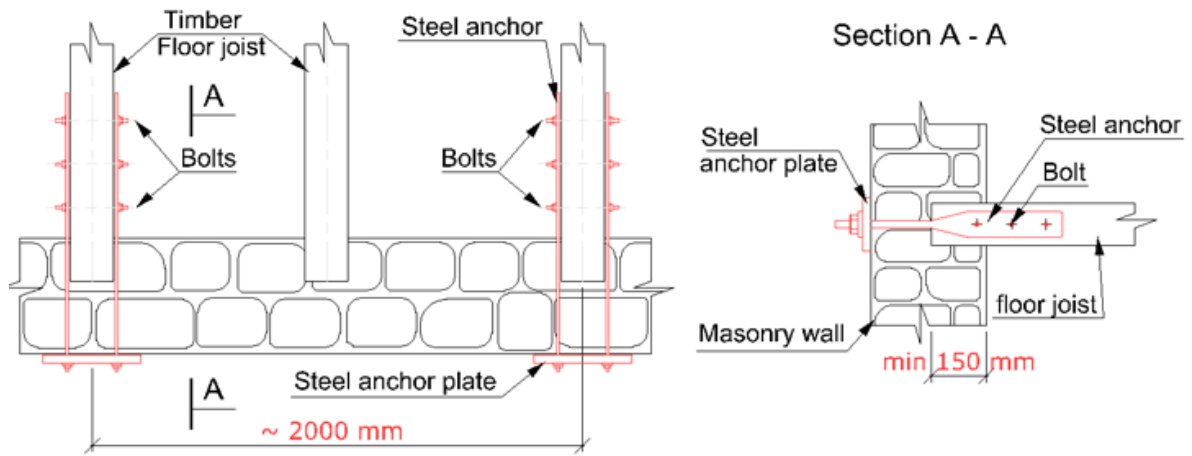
Detail for anchoring of timber joists to stone masonry wall [45]
